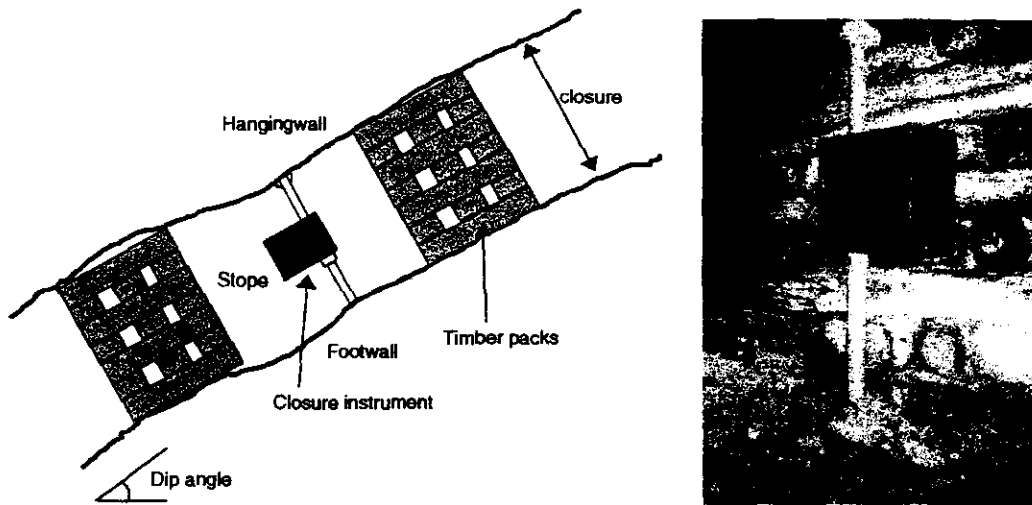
Installation of the closure instrument normal to the plane of the excavation.
